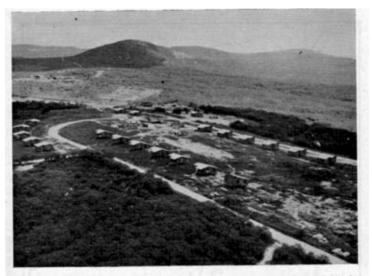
Bukit Mendi Village under construction. The completed houses are occupied by the construction force
